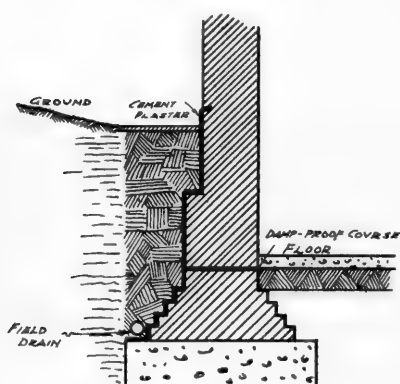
Section of a retaining wall with cement or rock asphalt vertical course and asphalt damp-proof course. Note the field drain covered by dry stone infilling.
